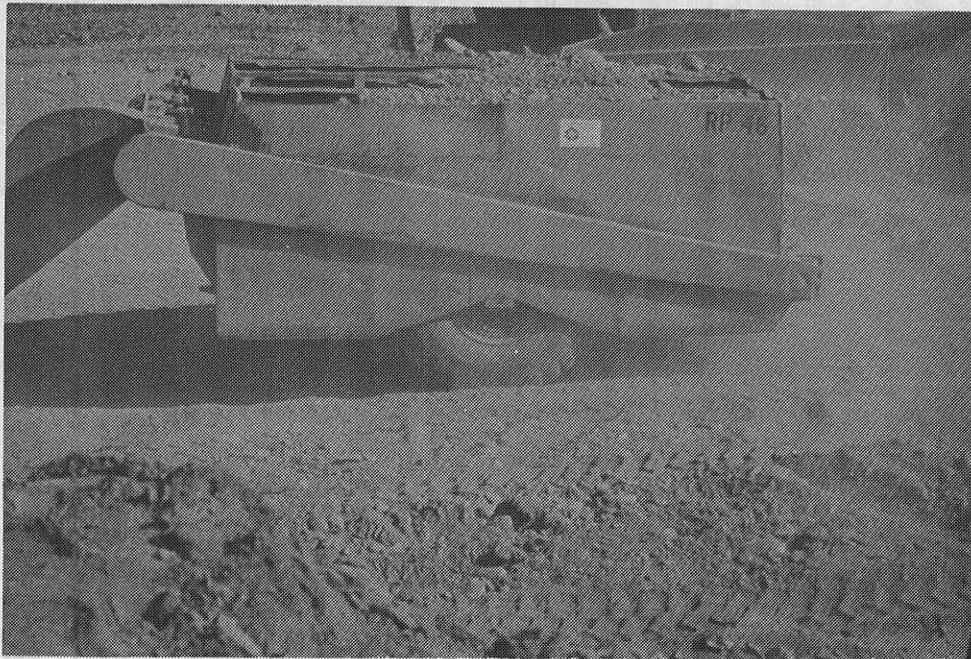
50-ton roller used to proof roll the foundation. April 1984
